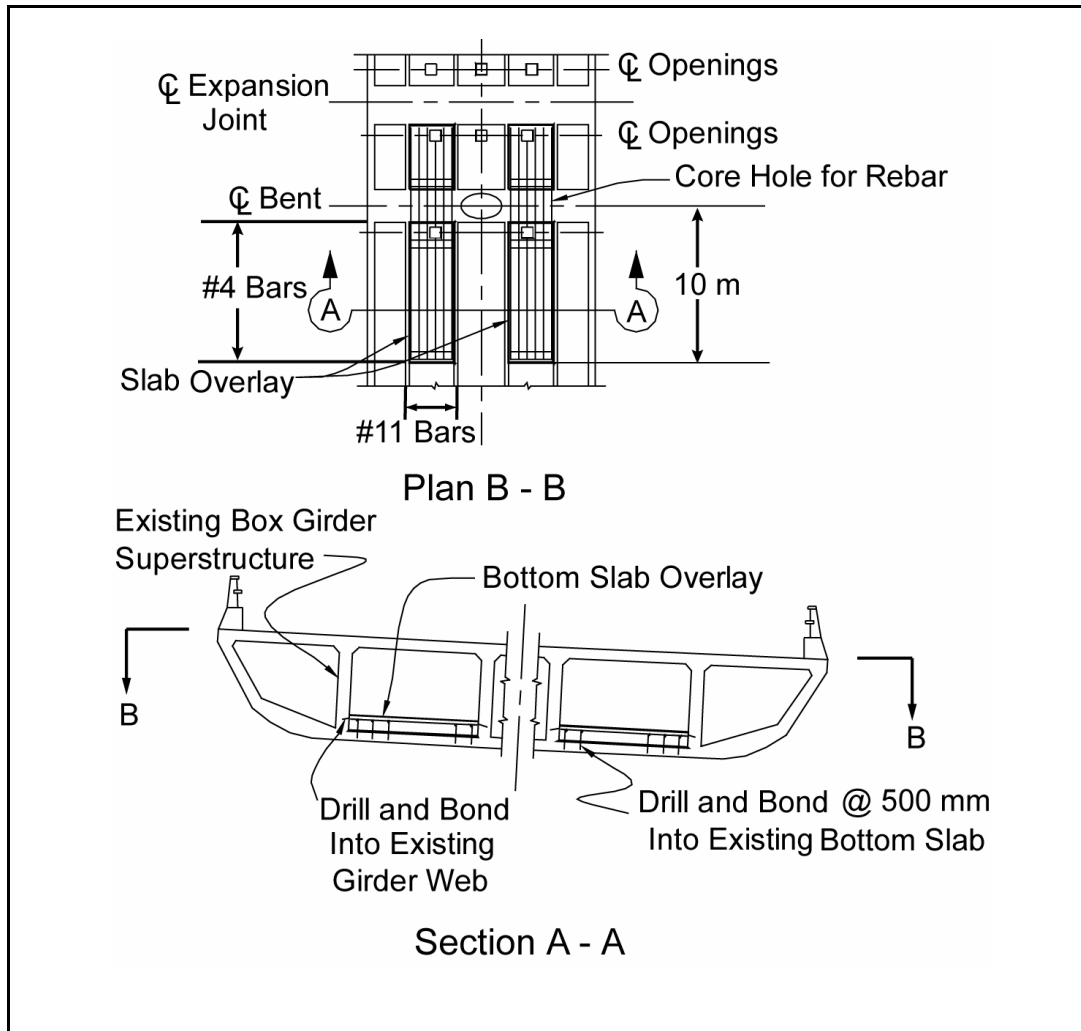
Retrofit of concrete box girder for flexural capacity.
